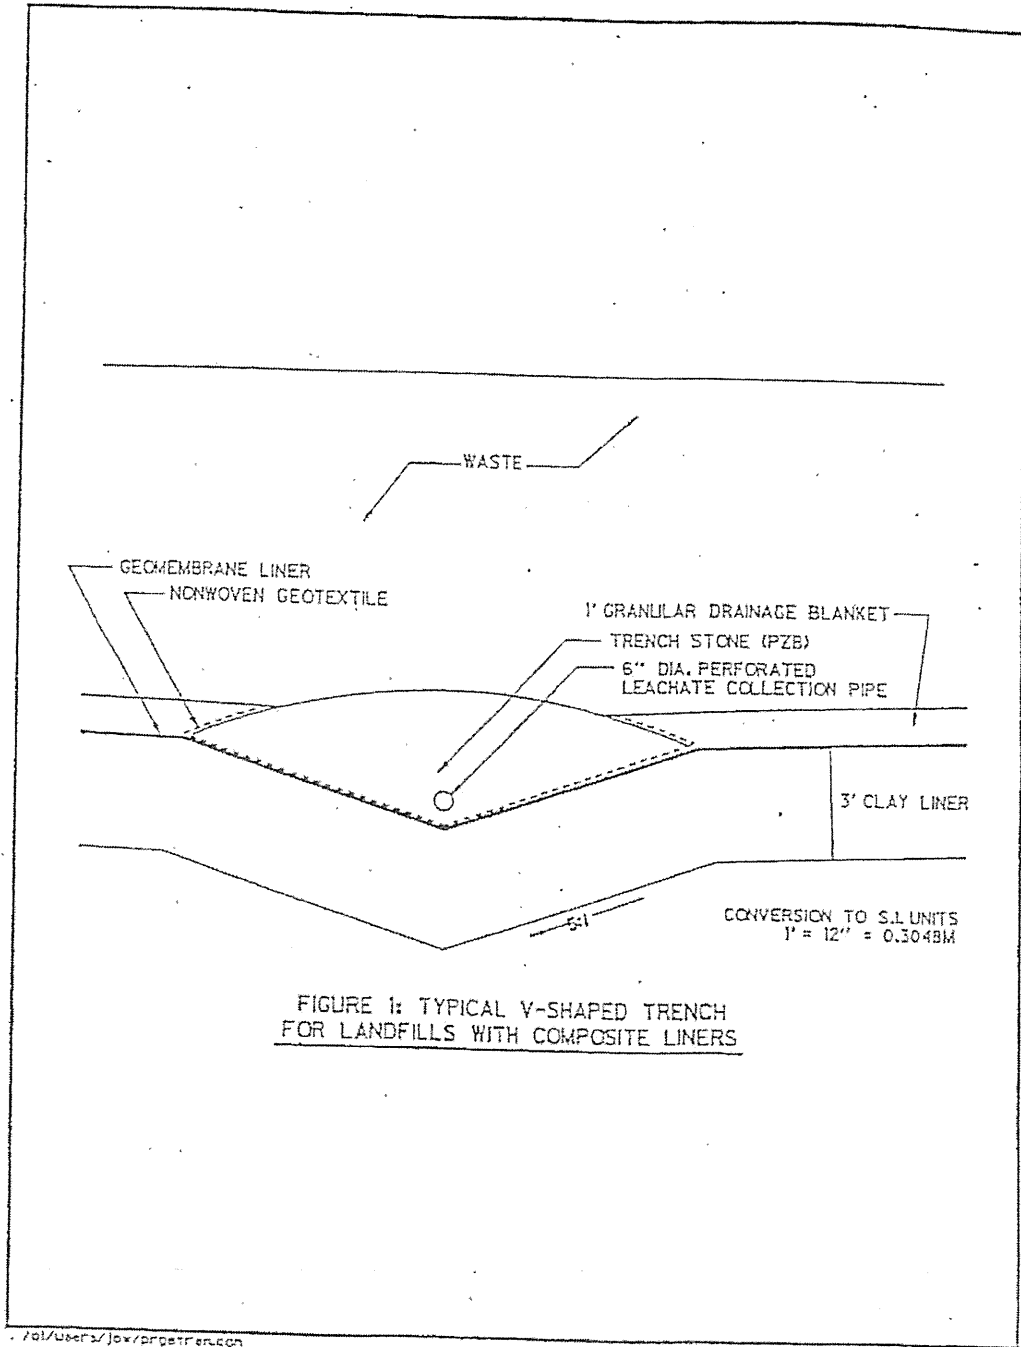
TYPICAL V-SHAPED TRENCH FOR LANDFILLS WITH COMPOSITE LINERS
